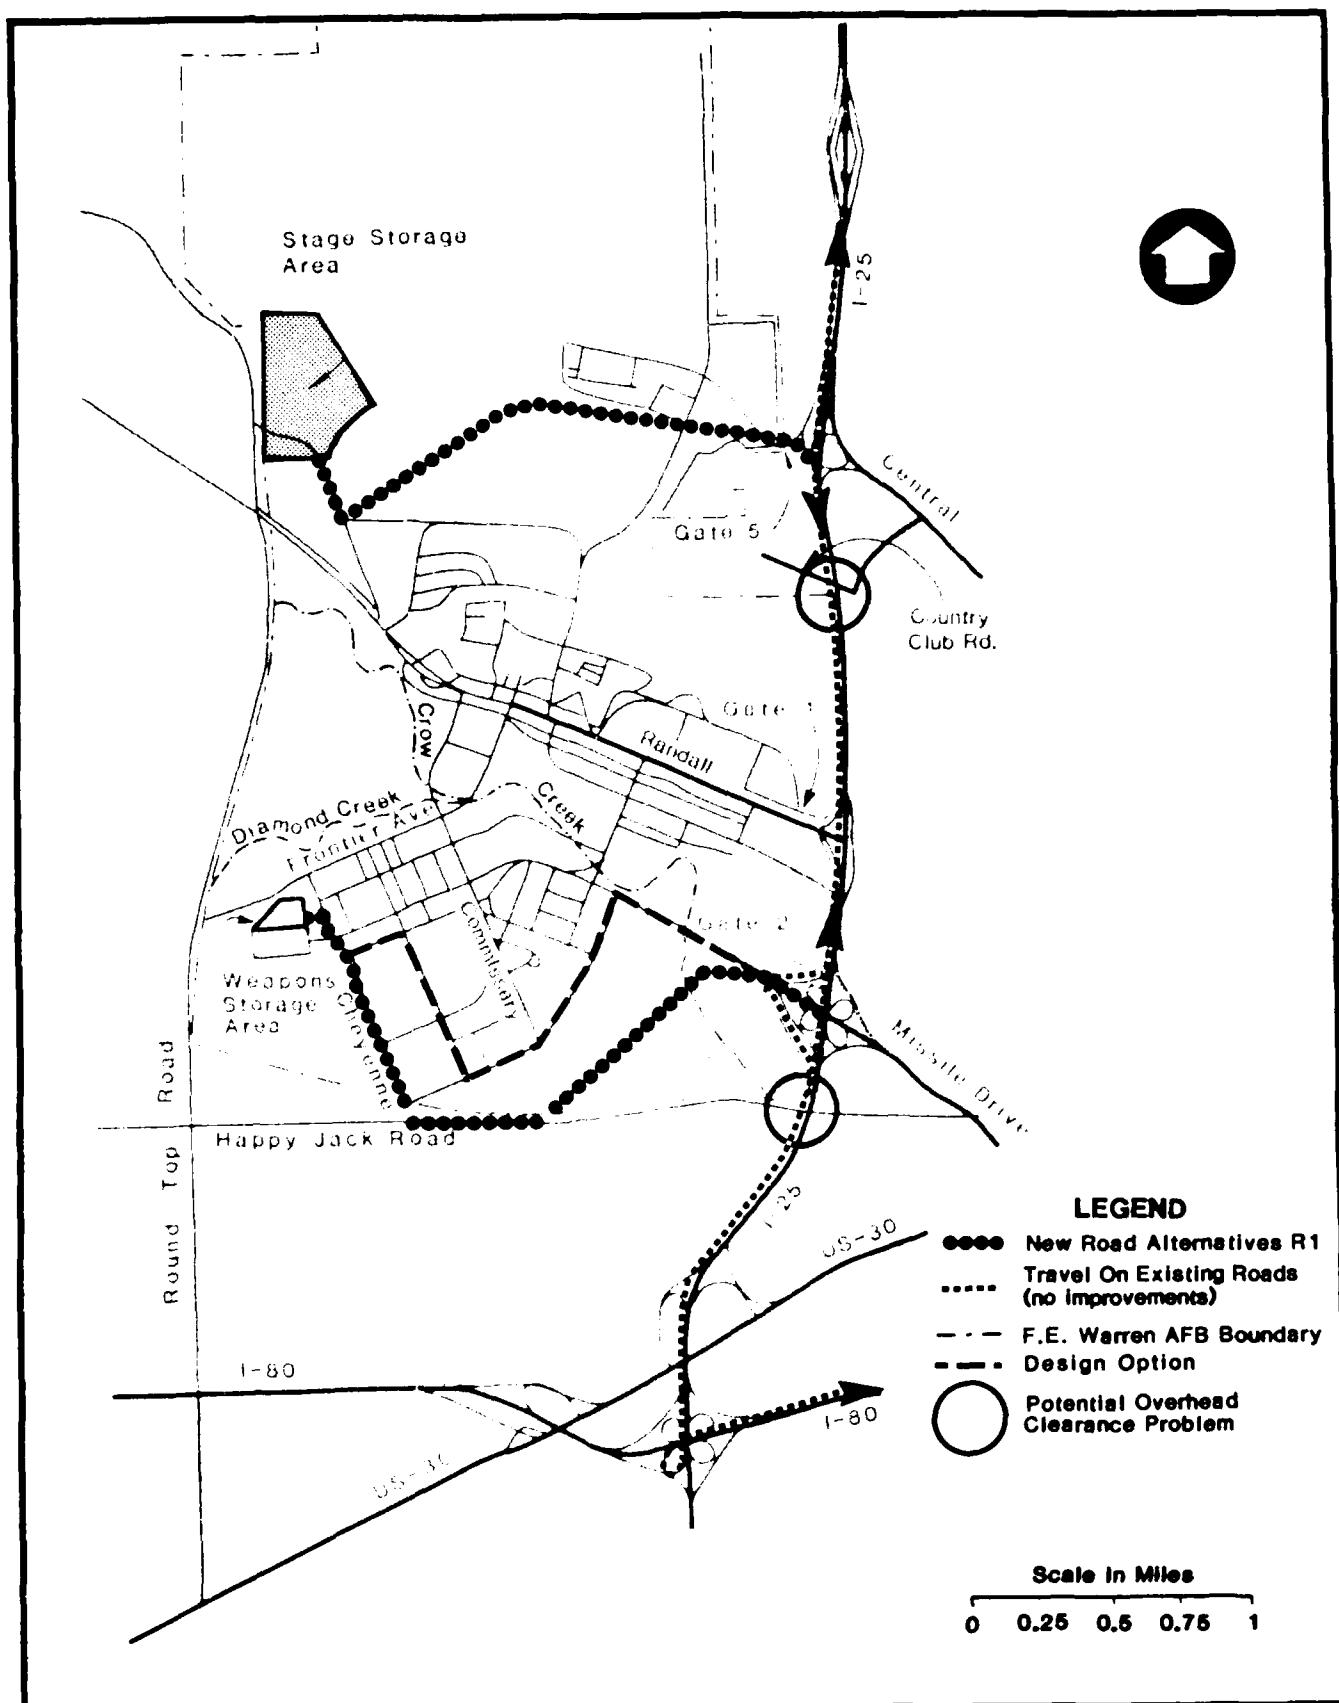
NEW ROADS AT F.E. WARREN AFB: ALTERNATIVE R1
